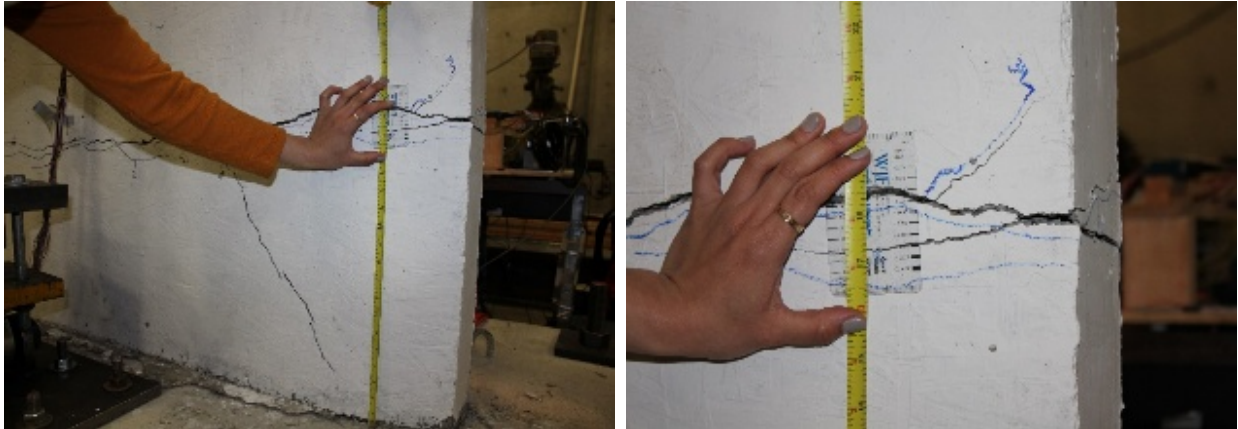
Wall Damage at 0.8% Drift
